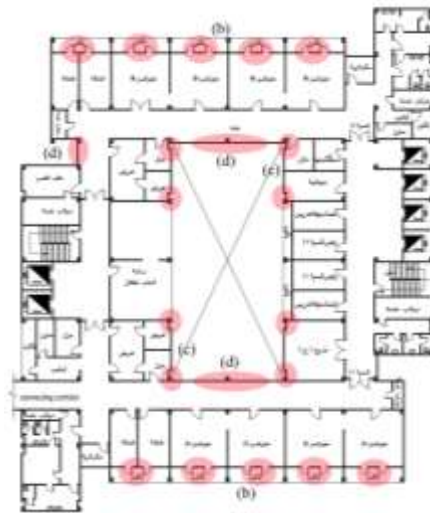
Proposal to improve natural lighting and ventilation in the main building.
